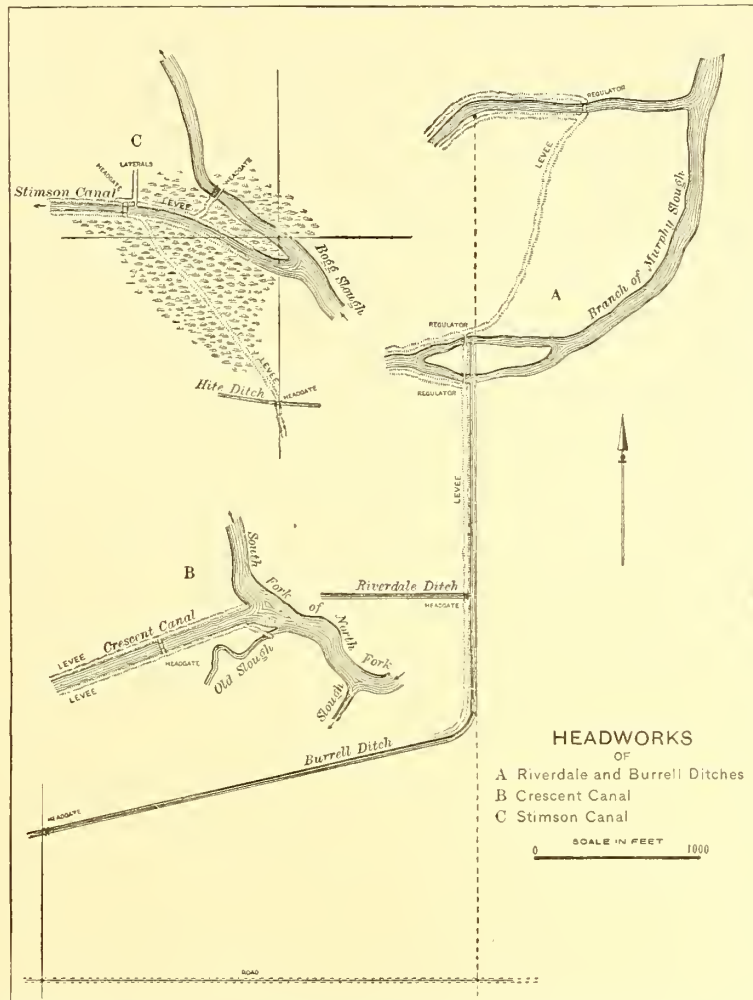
A, headworks of Riverdale and Burrell ditches; B, headworks of Crescent Canal; C, headworks of Stimson Canal.
